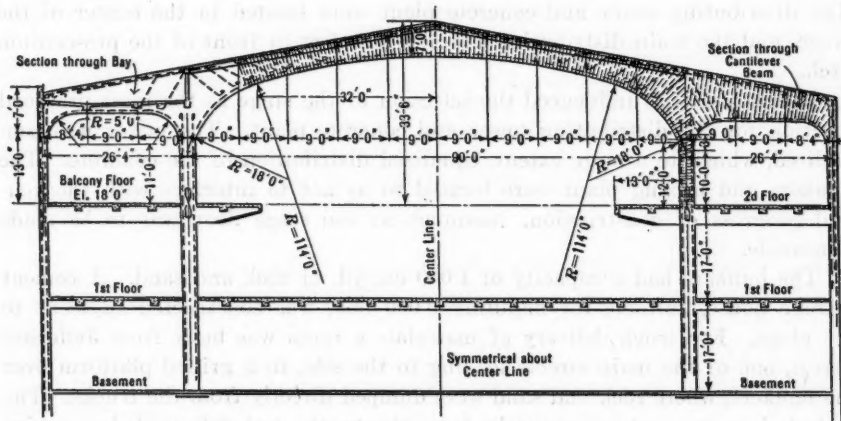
CROSS-SECTION OF BANQUET HALL, SHOWING CONTINUOUS ROOF GIRDERS.
